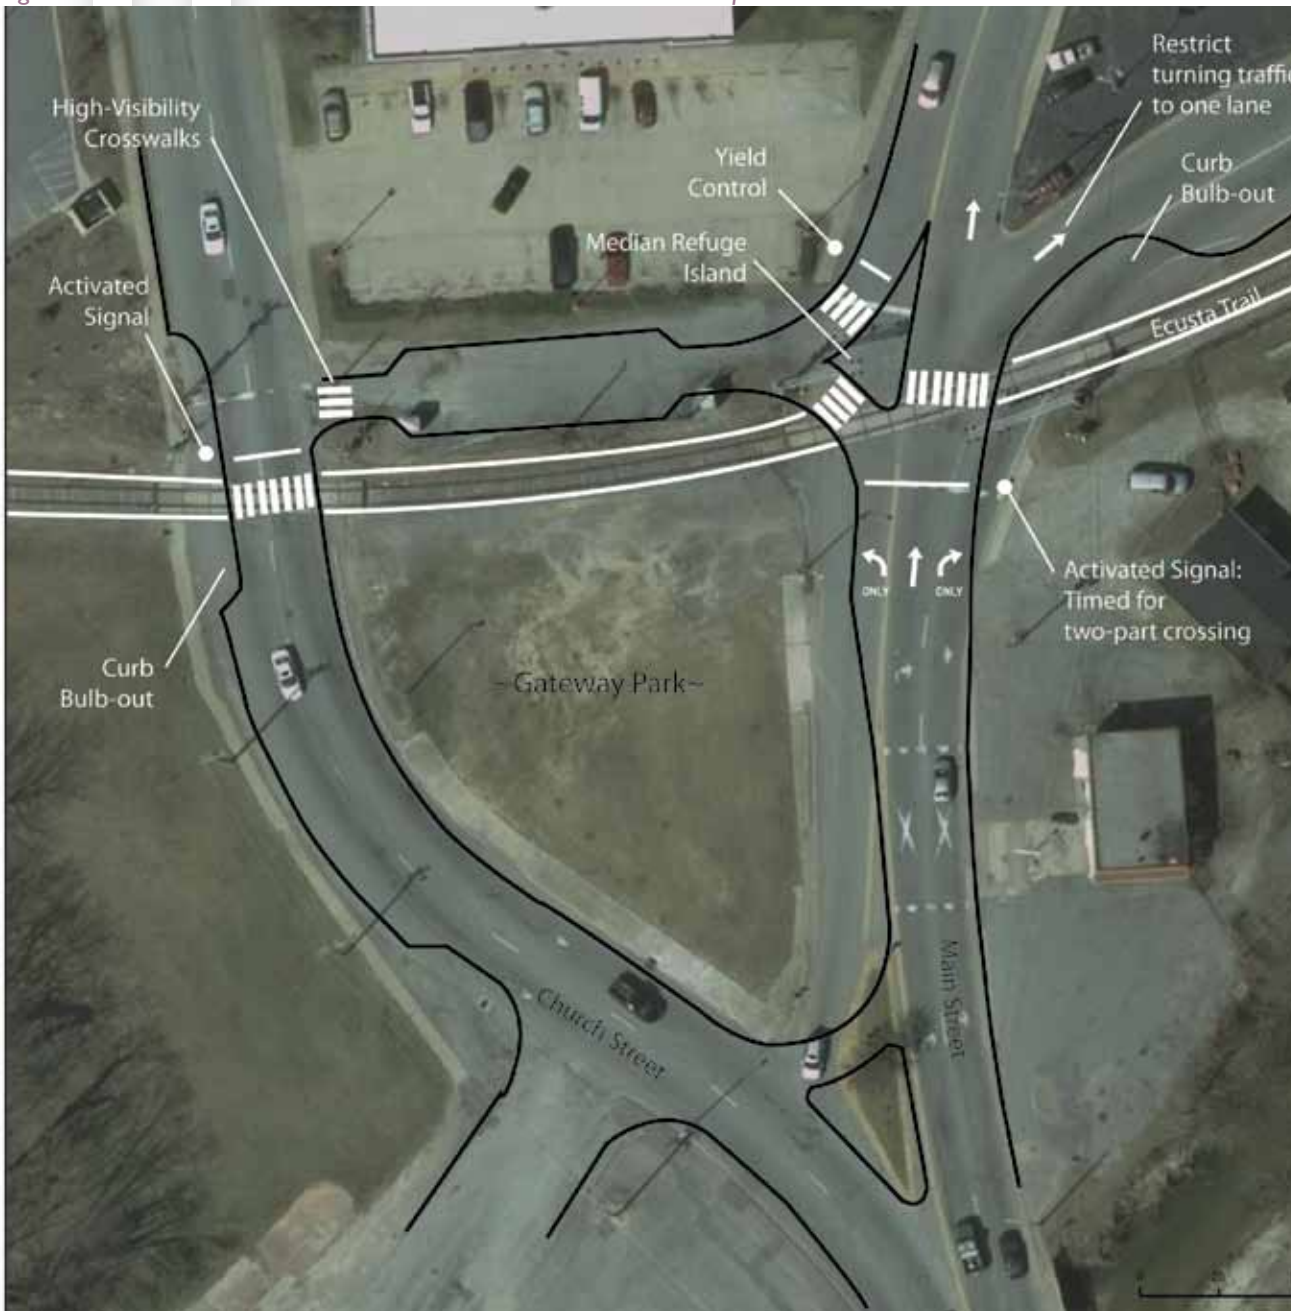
Ecusta & Main Street/Church Street Intersection Improvements
